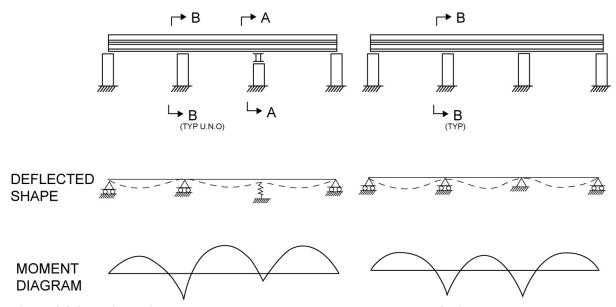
Bridge with three concrete hammerhead supports and one flexible steel bent cap support versus a bridge with four concrete hammerhead supports
